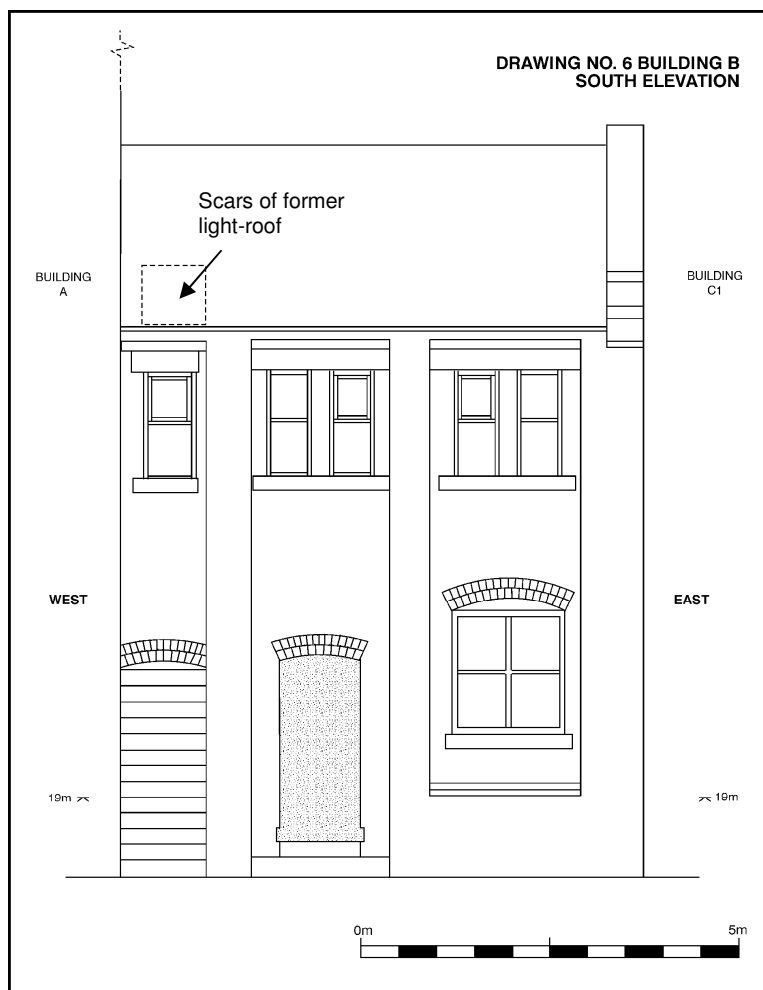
Survey drawing of the south elevation of Building B (scale 1:100)
